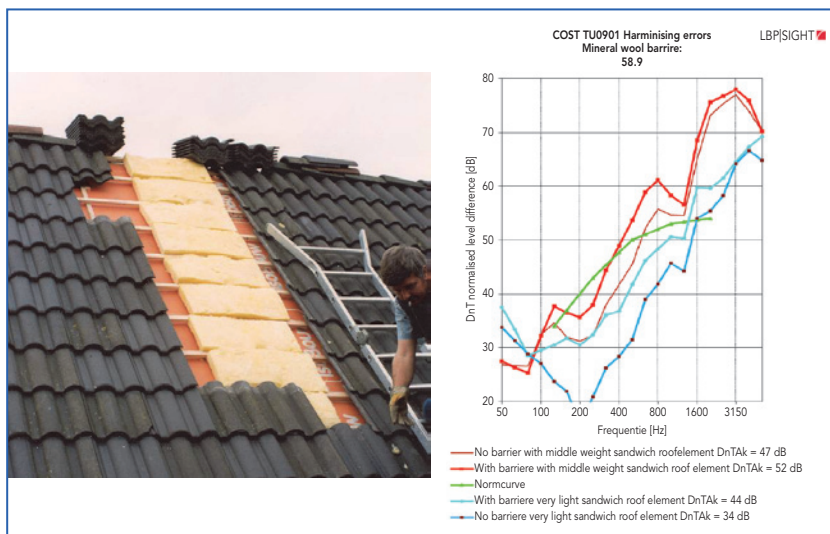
In case of lightweight sandwich roof elements and single leaf elements with EPS, PUR or PIR as thermal insulation, a mineral wool barrier is needed on the upper side of the separating wall(left). The better the roof element the smaller the effect of this barrier. See also (Lichtveld 1979).
